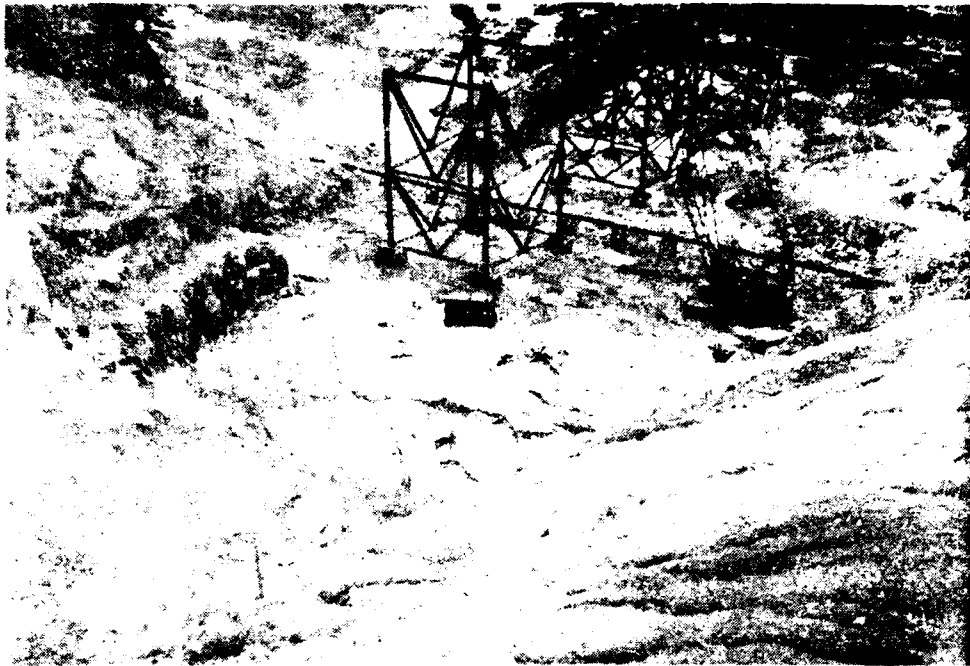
View of excavated Monoliths 27, 26, and 25 from the upstream side of Monolith 30. Note EHC dikes and faulting, and trestle construction, top center (August 1979)
